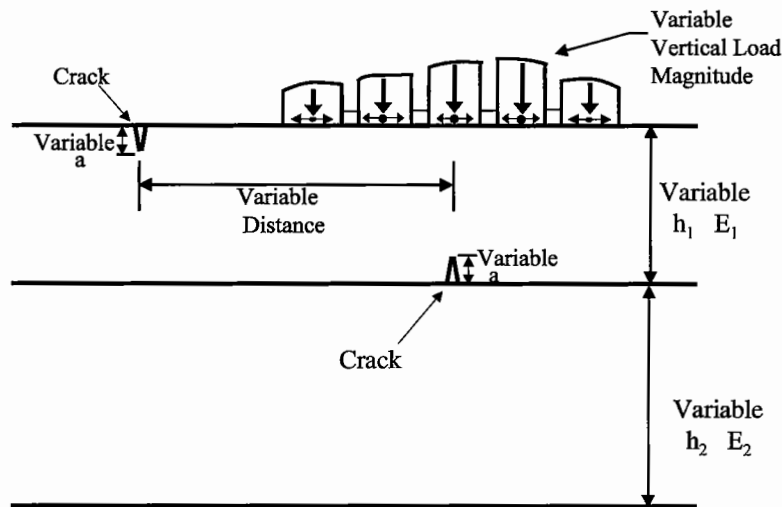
Example application: parametric study of a cracked pavement.
